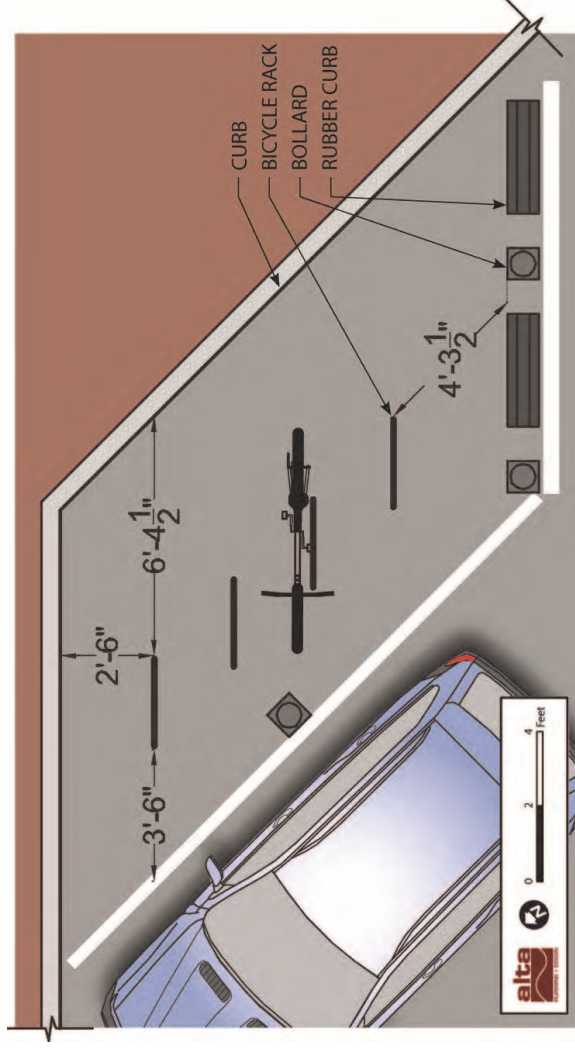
5th Avenue and B Street Bicycle Parking Plan View
